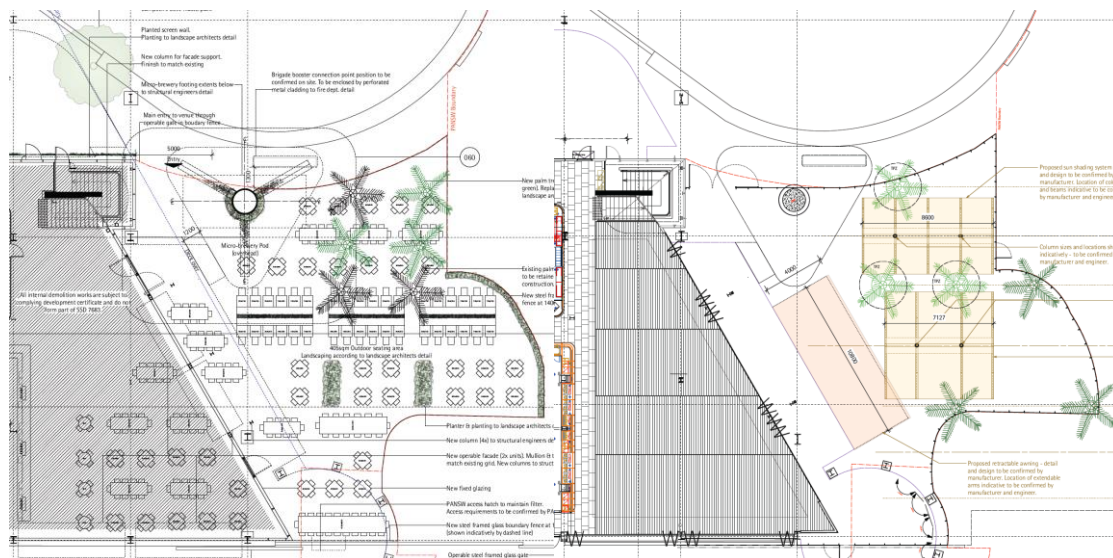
Ground, Level 1, floor plan existing (L), proposed (R)
